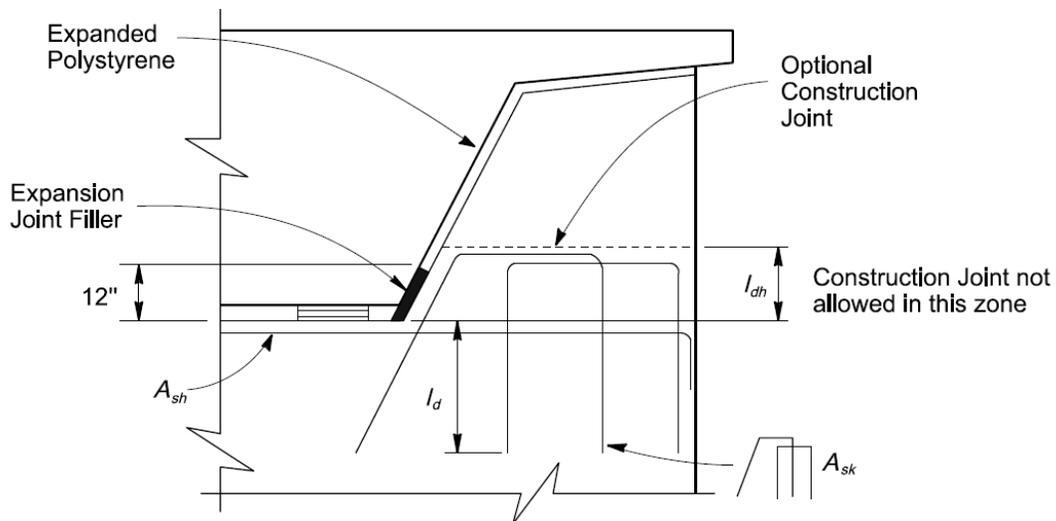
Monolithic Shear Key Reinforcement Details
